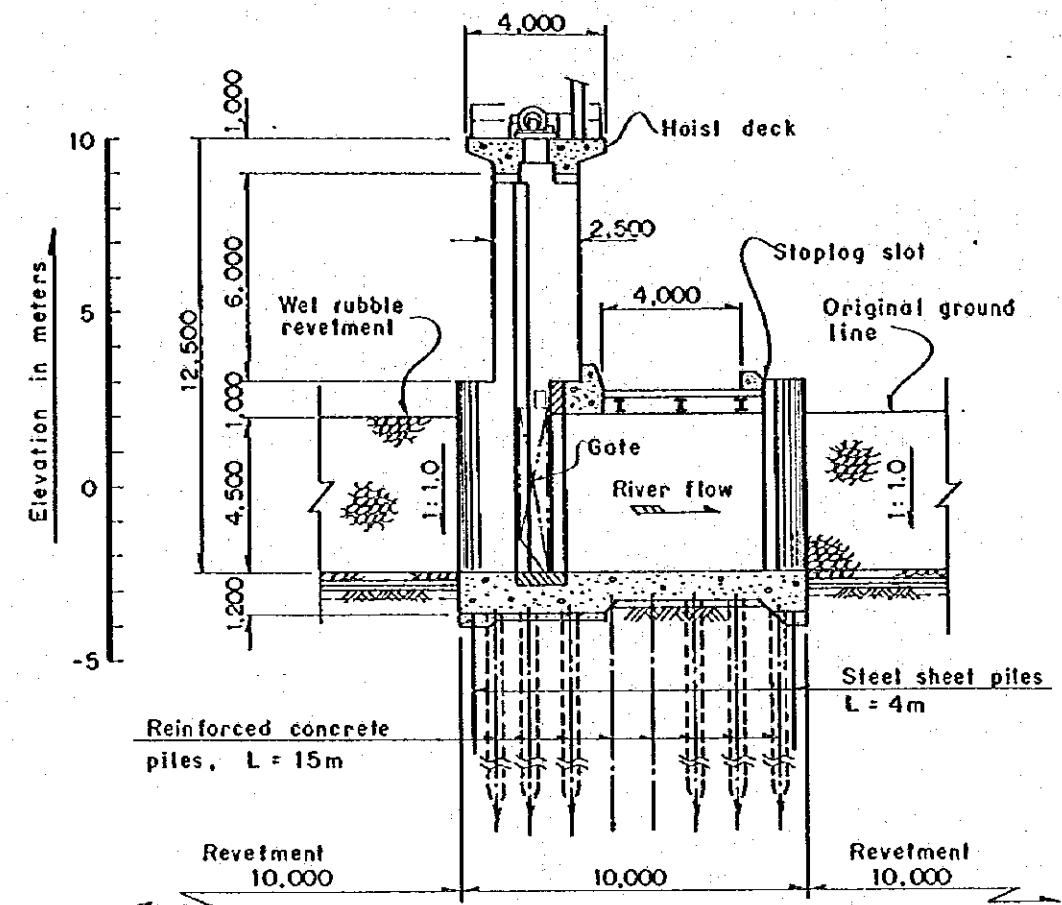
Alternative 3 : Sluice Conduit Details
